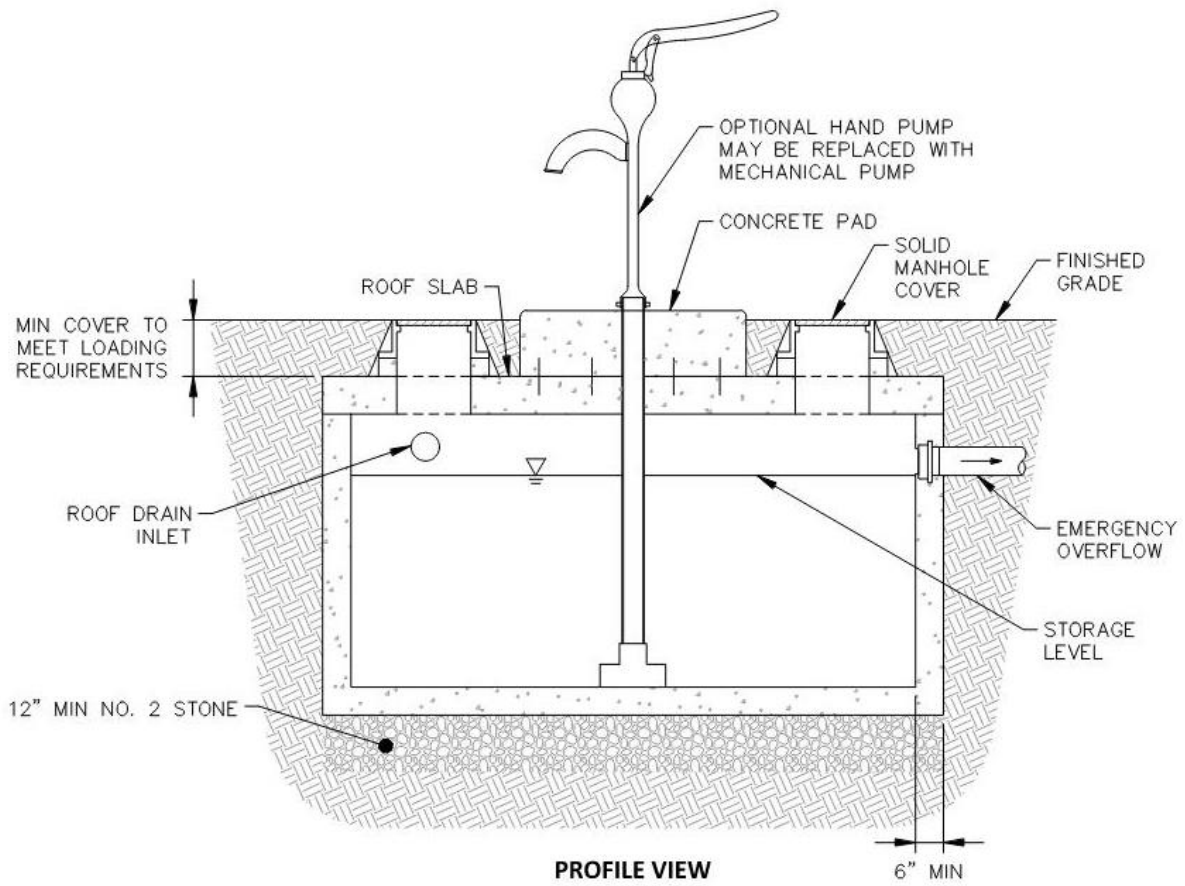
Underground Concrete Rainwater Harvesting Tank (RR-8)
